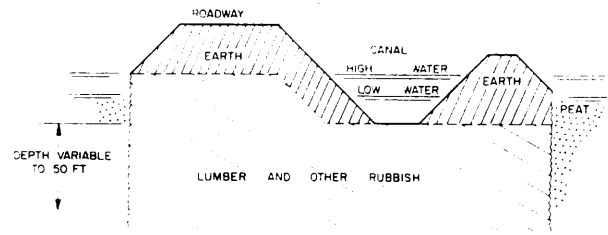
SECTION OF LANDFILL SHOWING THE CANAL
